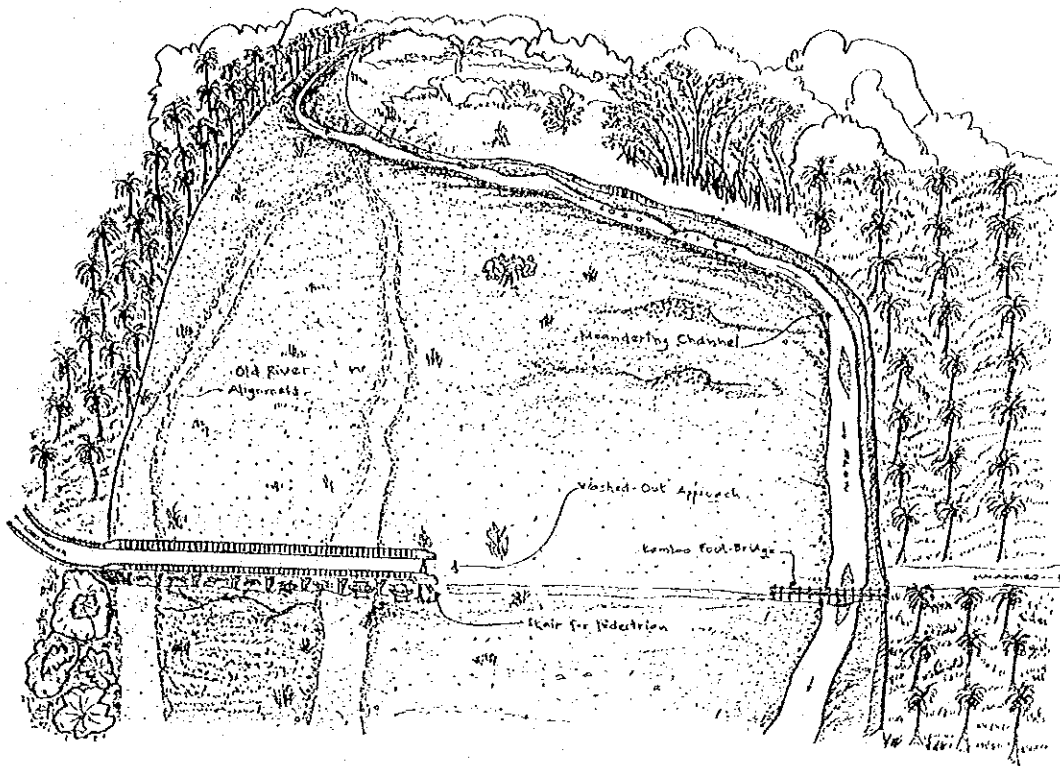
SIDE VIEW SKETCH OF LOBO BRIDGE (BS-33)
